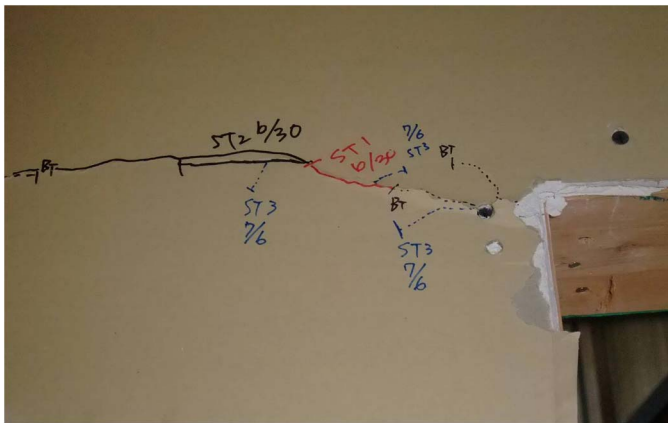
Crack on Wall A3, Story 2 (over window opening)
